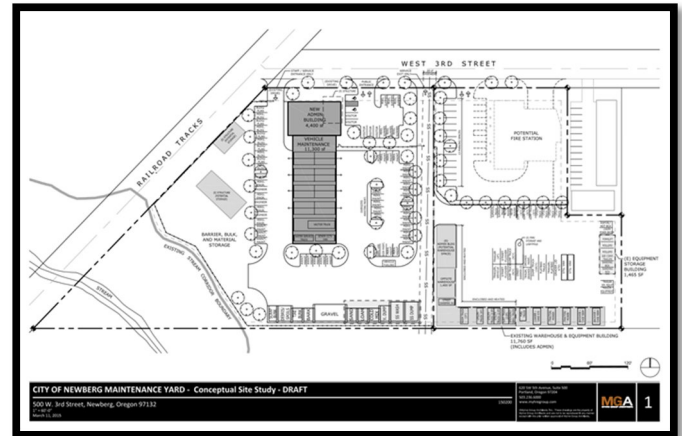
CONCEPTUAL PUBLIC WORKS MAINTENANCE YARD PLAN
